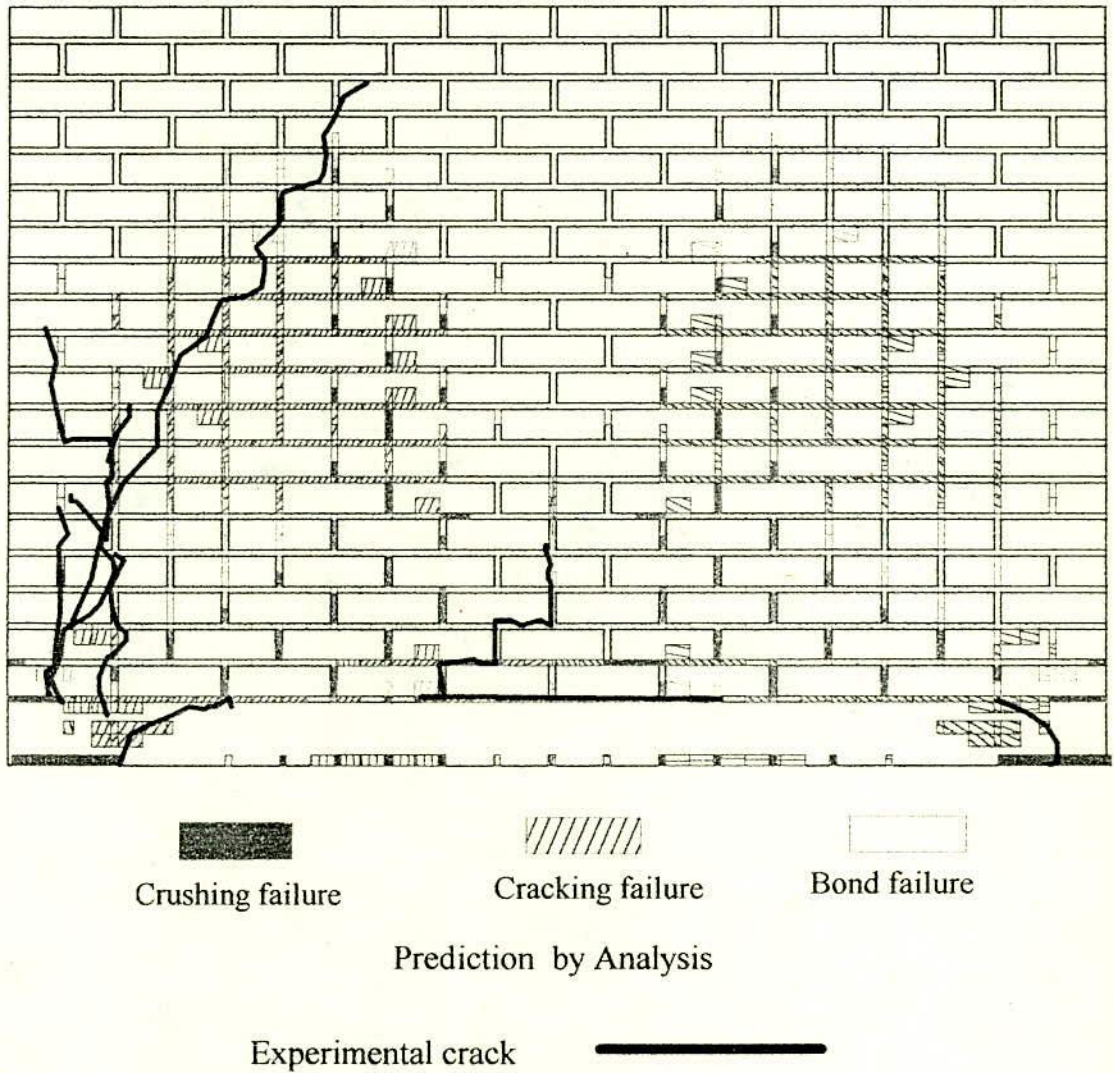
(b) Modes of Failure of Plane Wall-beam Panel
